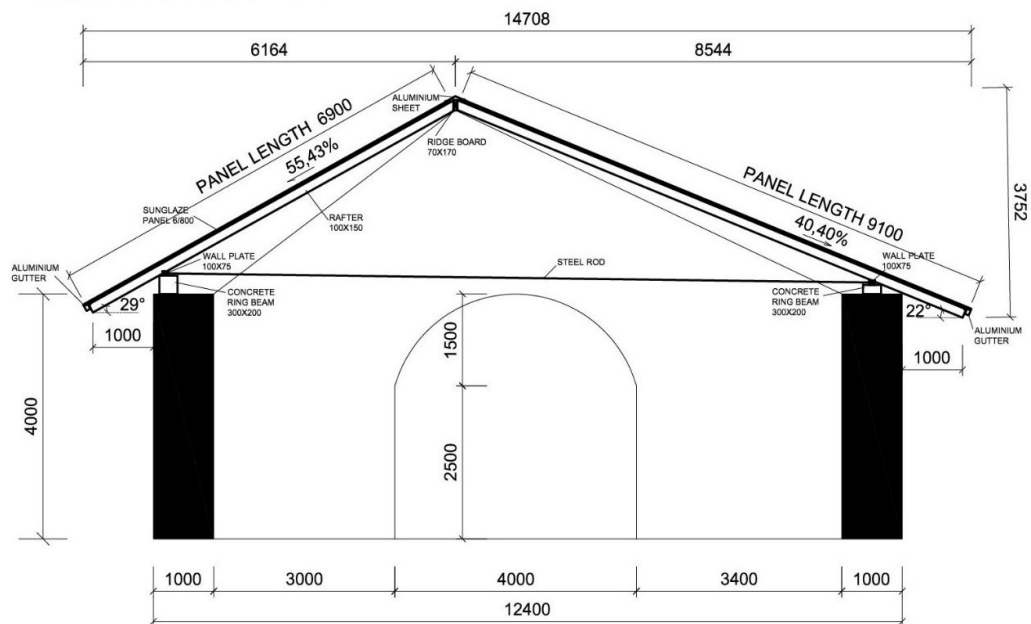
Section C-C' Roof above the old naiver (exterior roof)
